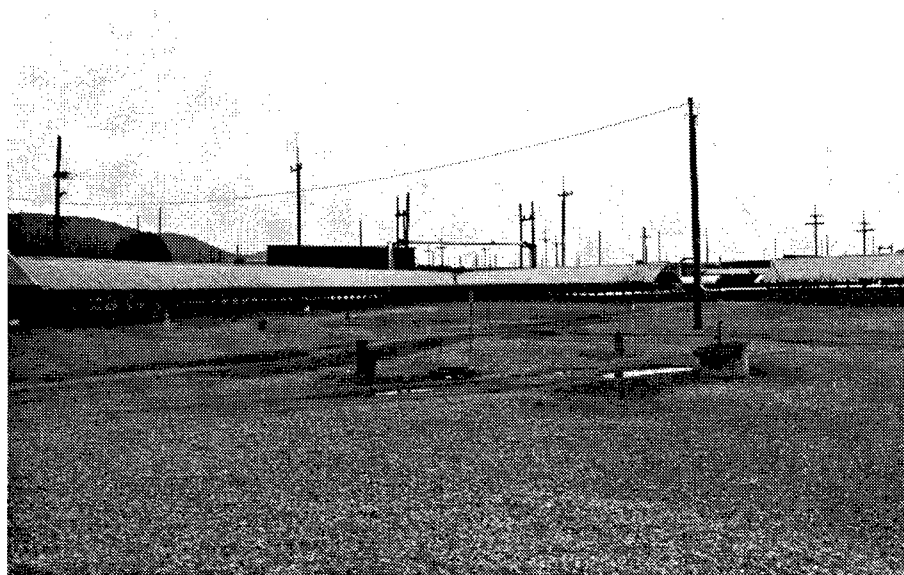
TNT Catwalk connecting Buildings I3 and J3.
